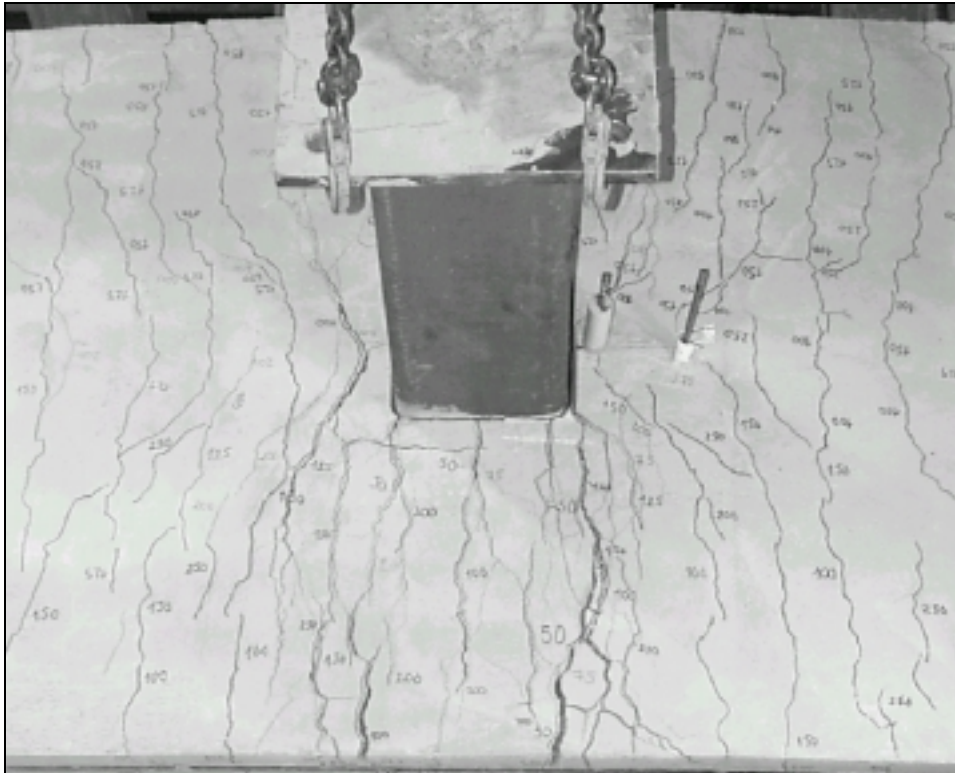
Typical crack pattern of the concrete slab (specimen CC3 after testing).
